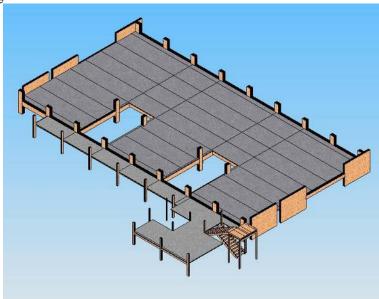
Structural slice through one floor of the timber and TimberPlus building.
